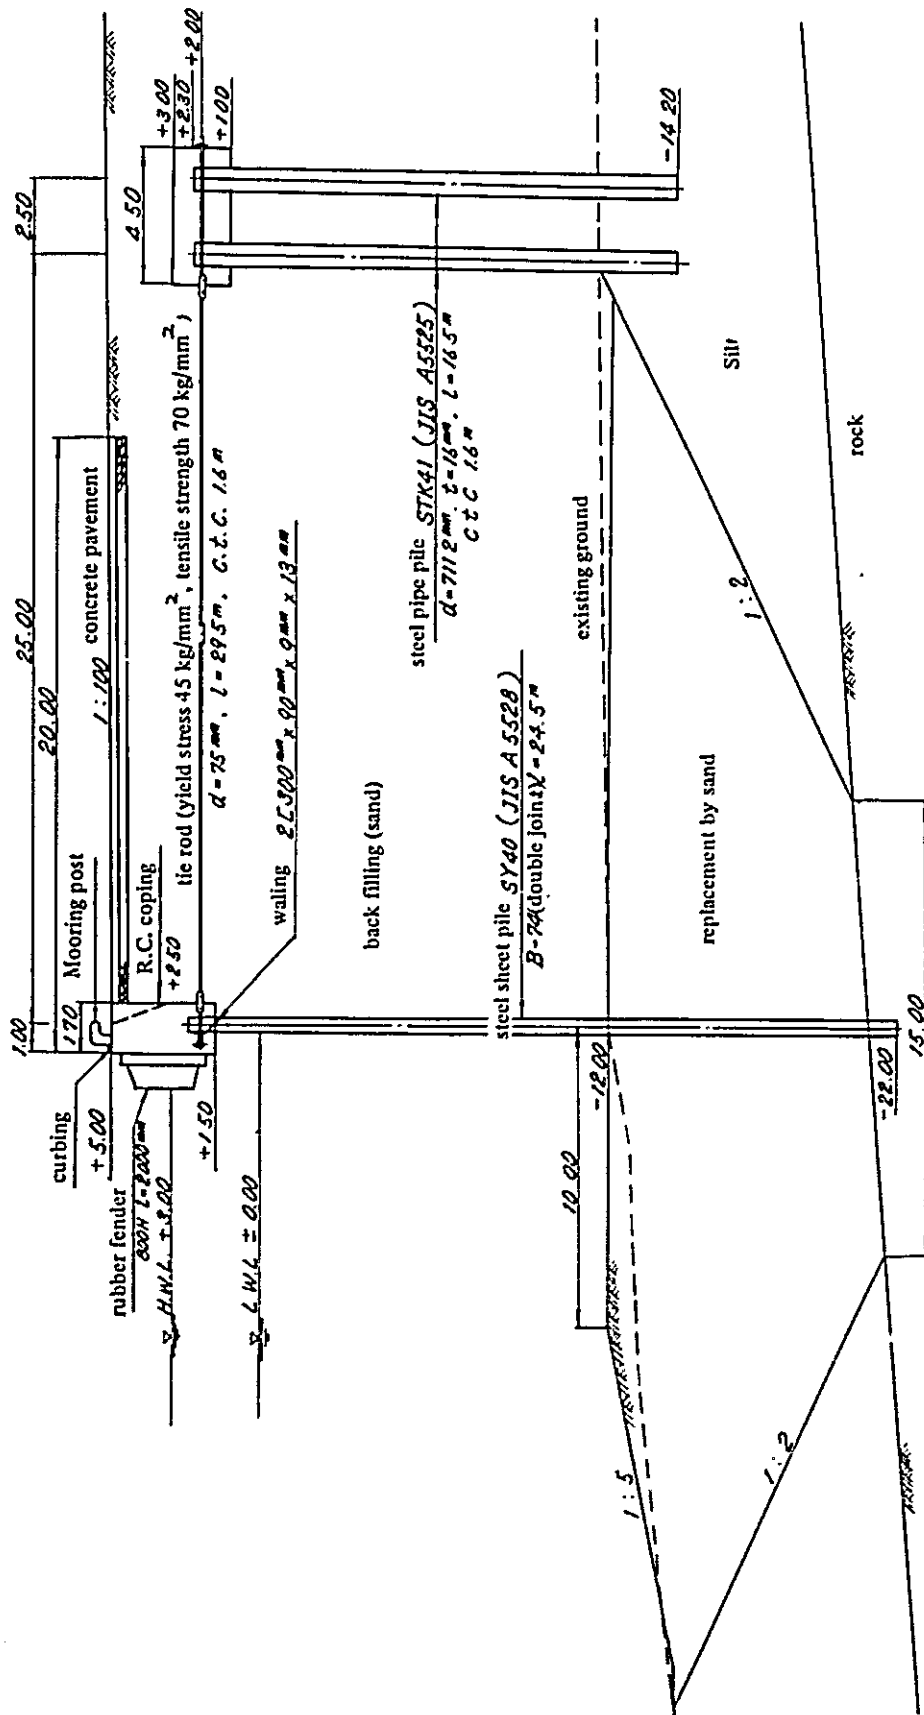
Standard Cross Section of -12m Quay Wall (Punta Morales)
